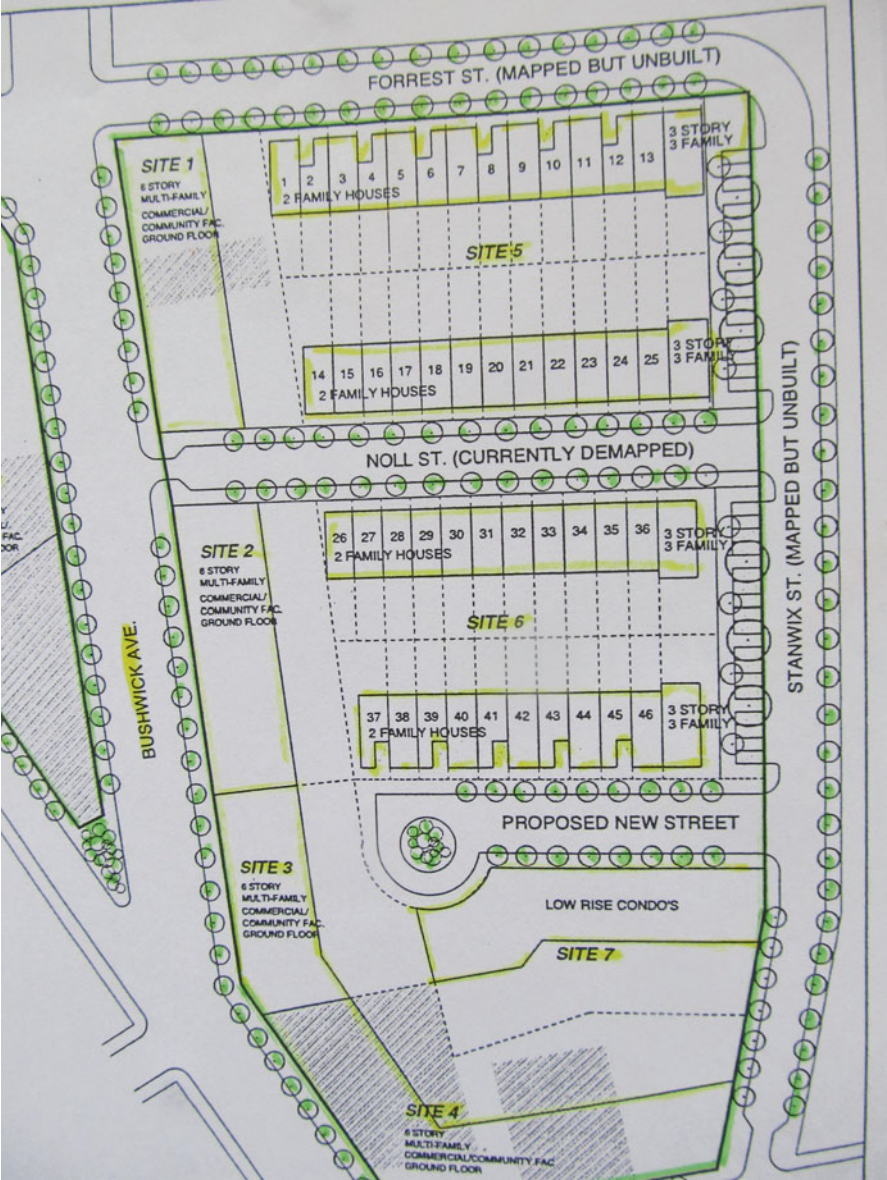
West Bushwick Rheingold Site – Project Planning Layout (Source: City of NY Layout 2002a, b)
